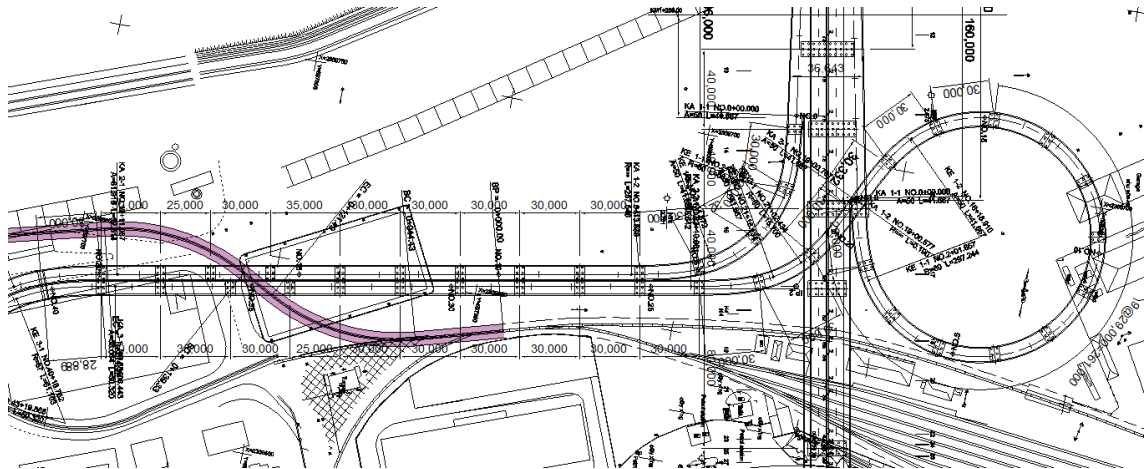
Span arrangement of JCT of Nguyen Trai South
